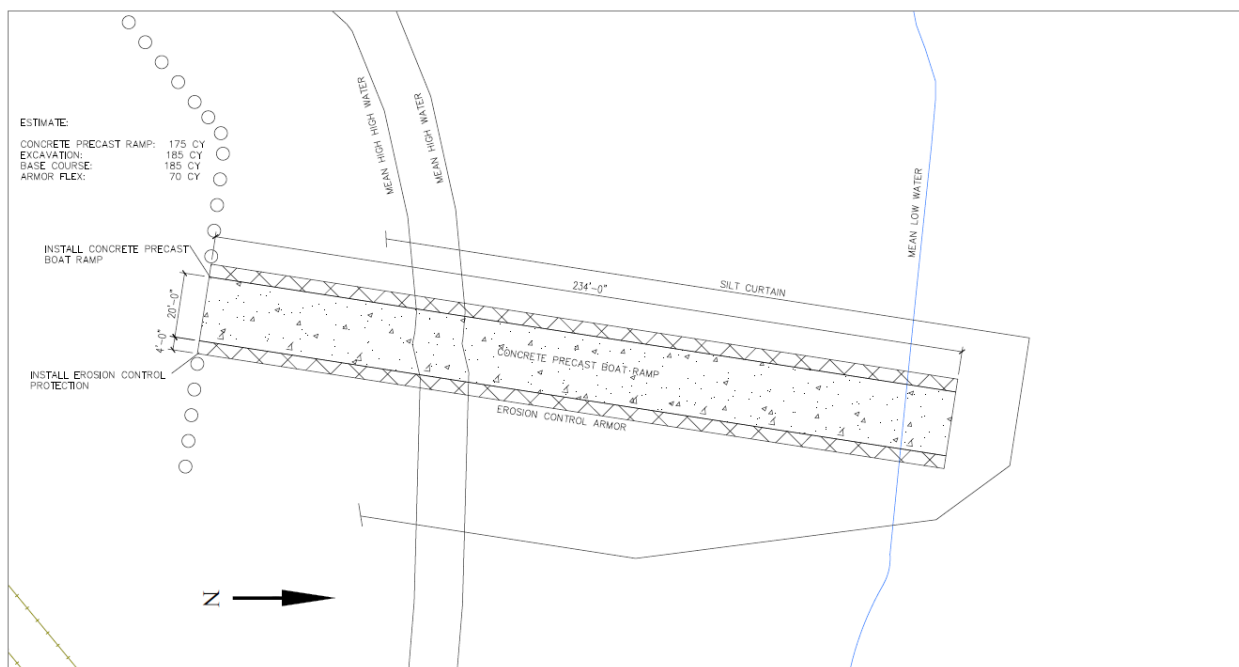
Zoomed-in plan view depicting the location of the proposed boat ramp
